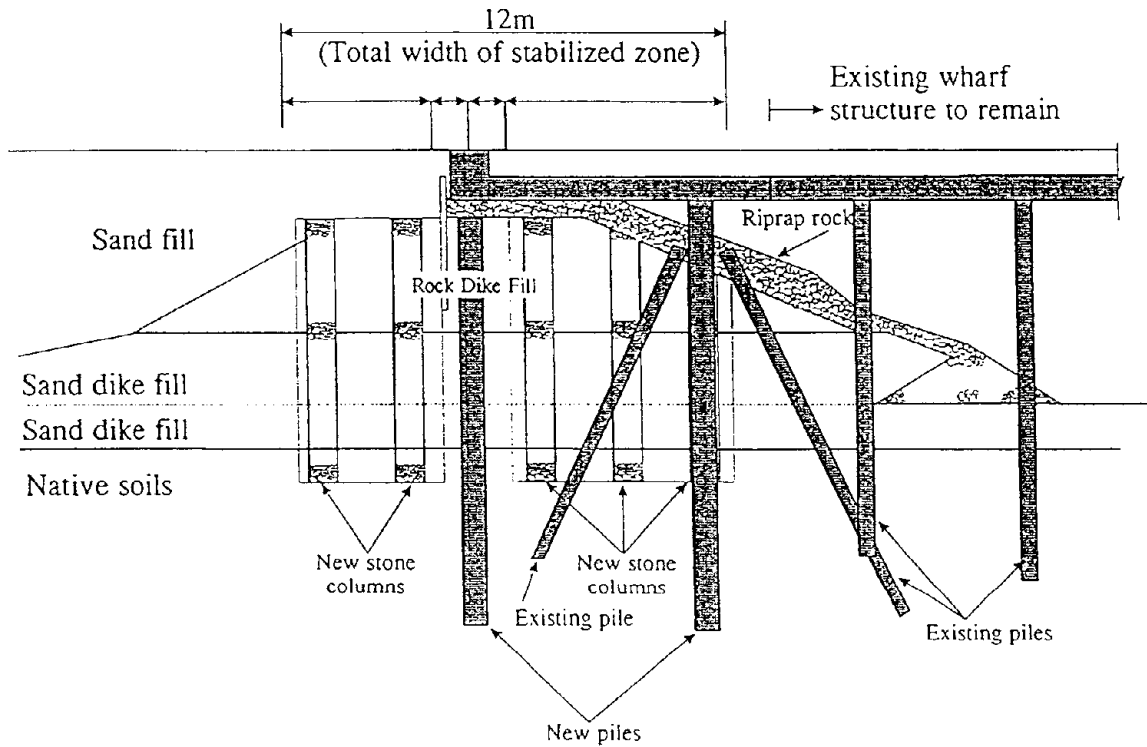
Stone column and new piling for Port of Oakland wharf repair.
